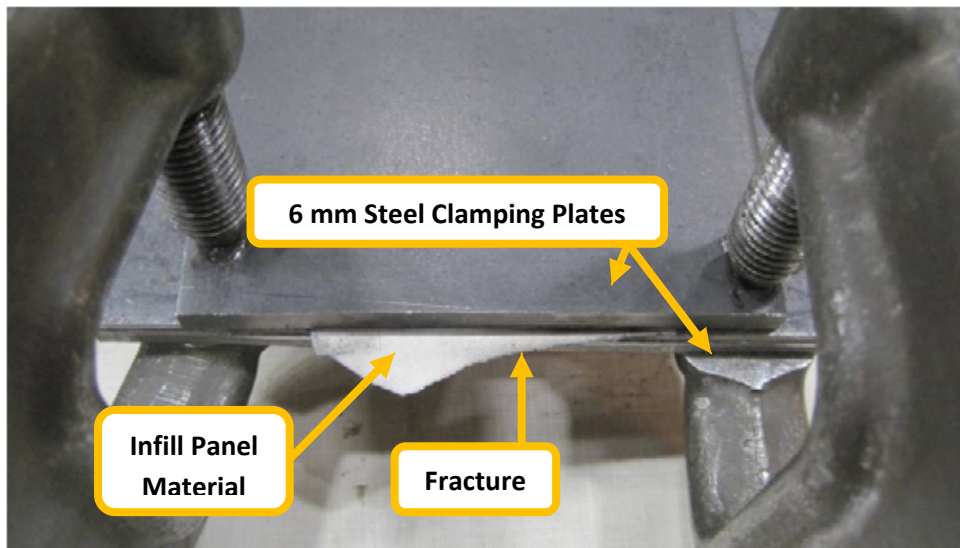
T2-C1 and T2-C2 Configurations; Early Failure at Clamped Edge of Steel Sheet
